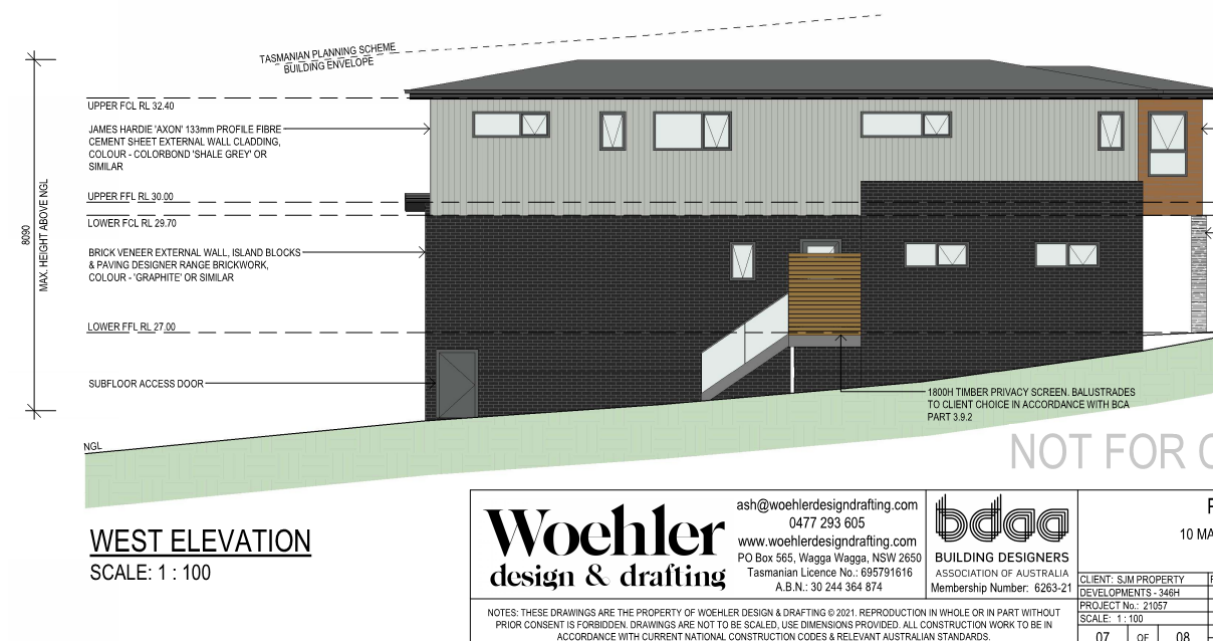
Amended drawings (Approx. building height of 8.1m – adjusted roof pitch)
